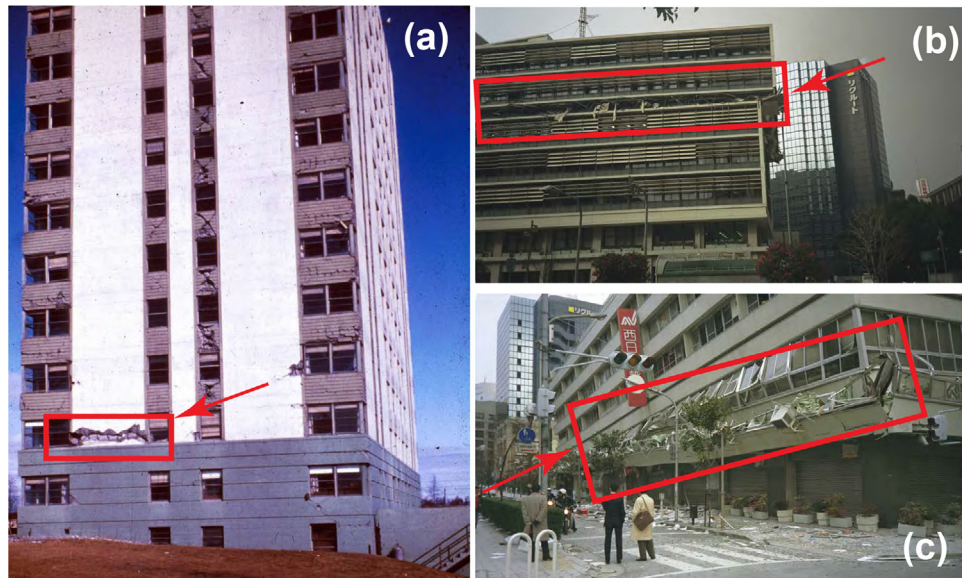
| (a) A 14-story reinforced concrete apartment building in Anchorage, Alaska, severely damaged during the 1964 Alaska earthquake. (Image courtesy of the USGS [10]). (b,c) Weak-story failure in the upper stories of buildings following the 1995 Kobe, Japan earthquake. (Images courtesy of the NOAA [11]).
